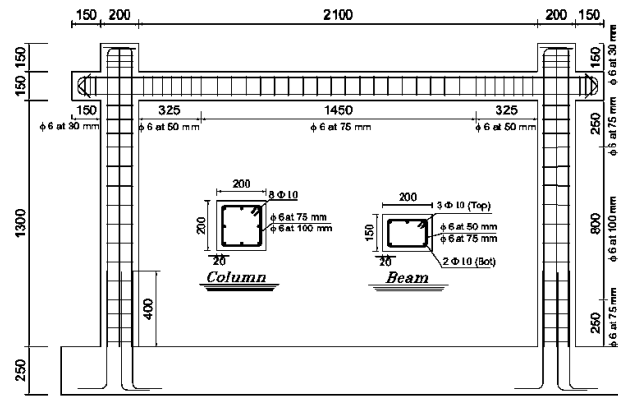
Geometry and reinforcing details of reinforced concrete frame (millimeter) (Mansouri et al., 2014)
